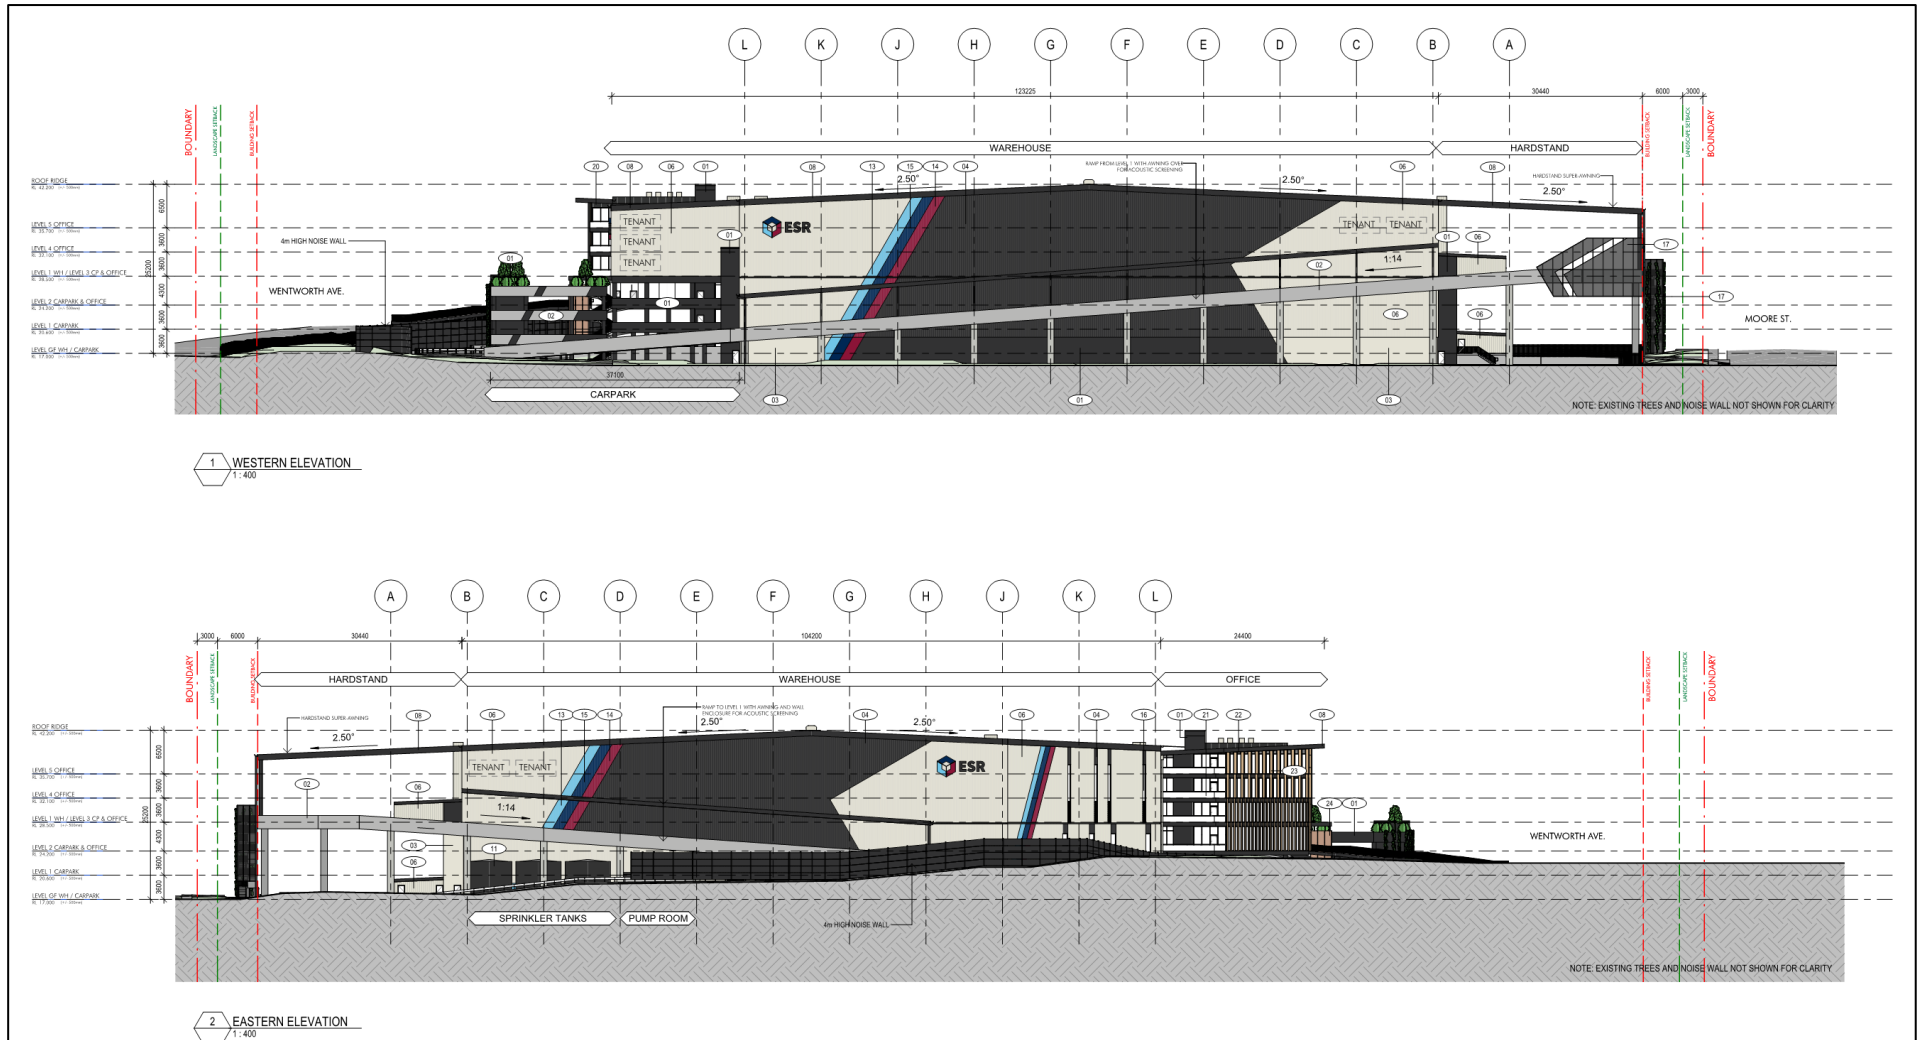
East and West Elevations (Nettletontribe Architects, 2024)
